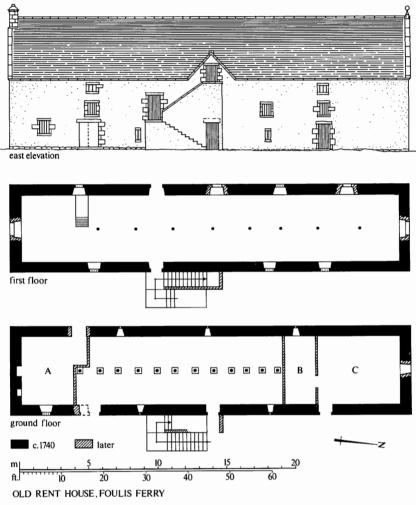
Plans and elevation, Foulis Ferry Old Rent House, 1983.
